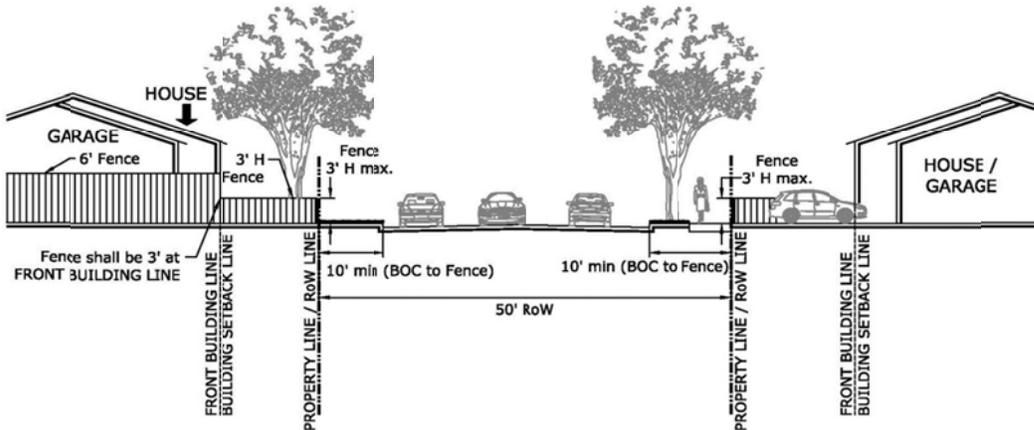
(e) - Typical Cross Section with NO Landscaped Area and Sidewalk
